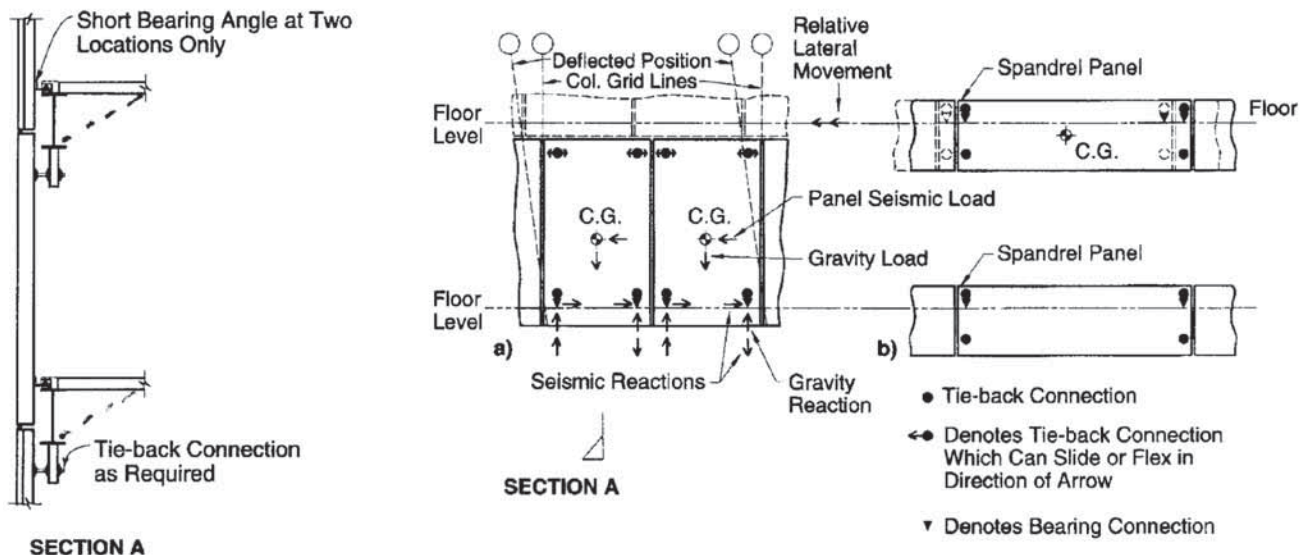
Panel connection concepts. (Taken from *Glass Fiber Reinforced Concrete Panels, Fourth Edition*, PCI. Used with permission, Precast/Prestressed Concrete Institute.)
